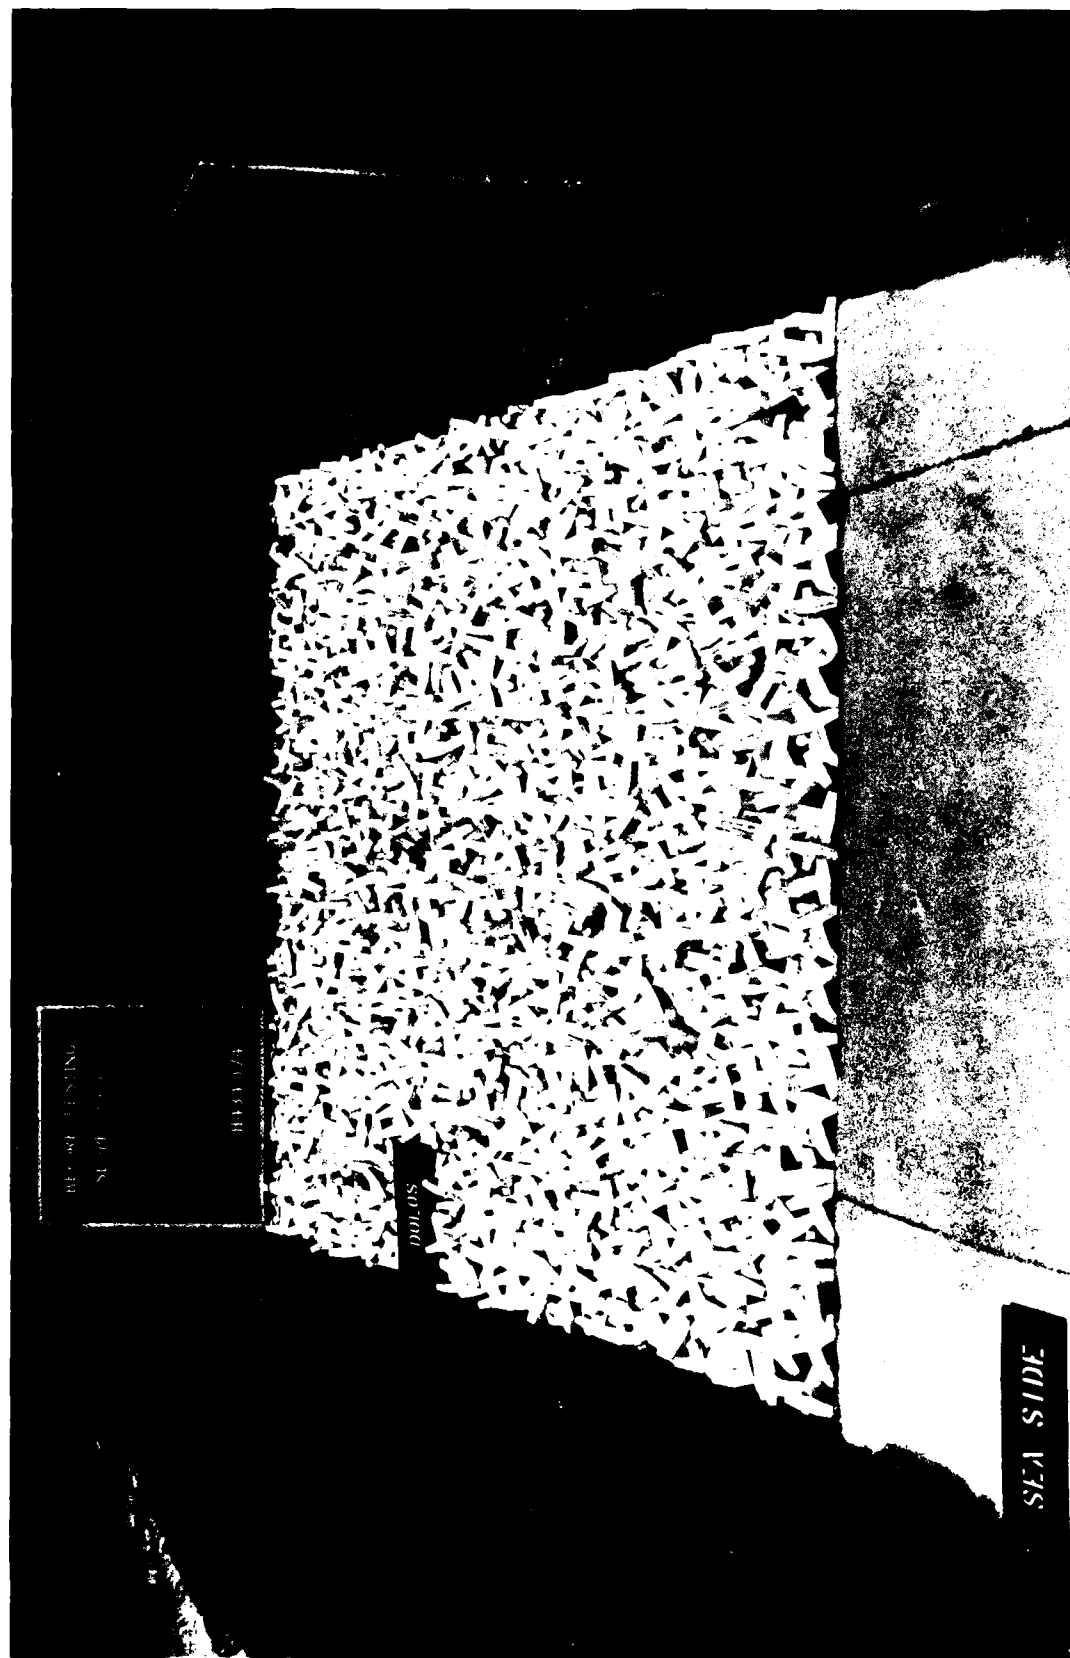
Sea-side view of a typical dolos section before wave attack at a 1V-on-3H sea-side structure slope;  $W_a = 0.276 \text{ lb}$
